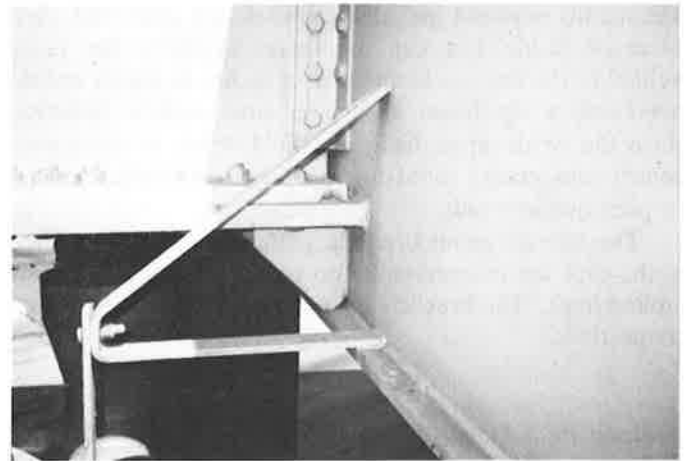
Roadway Drainpipe Welded to Cap Lower Flange
